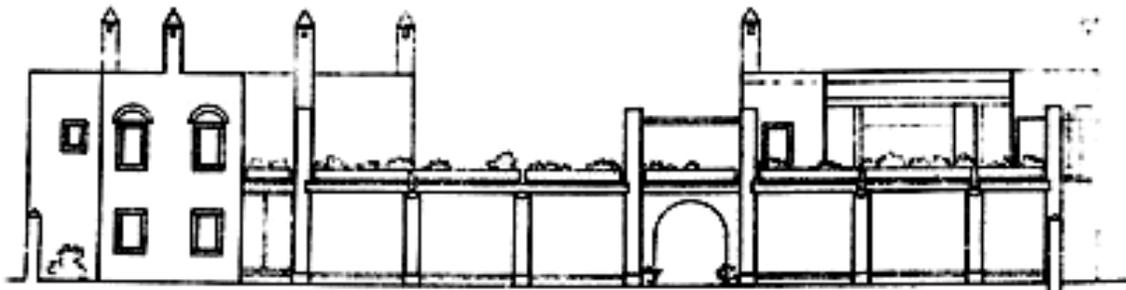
Garden elevation (Holod & Rastorfer, 1983b)
